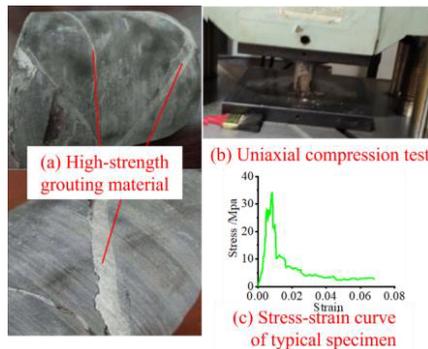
Core-drilling of rock mass after grouting and laboratory test
